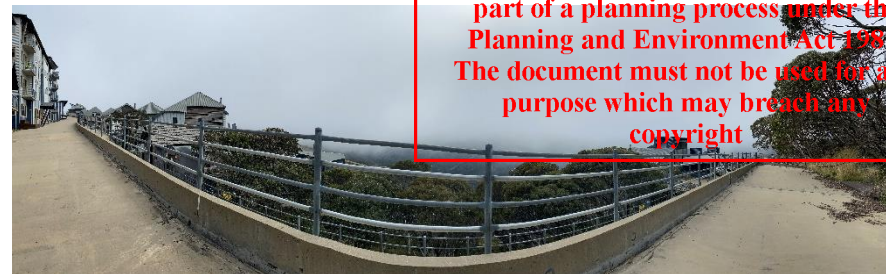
Existing streetscape of Hotplate Drive (photo is taken on the lower tier of the road)
